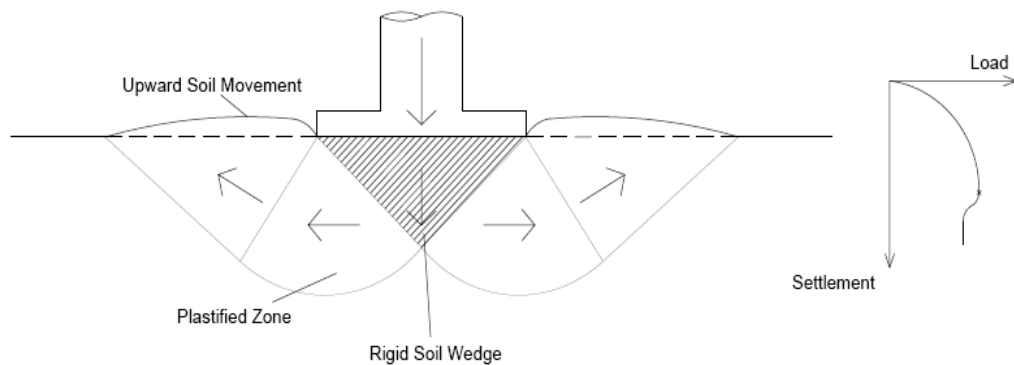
Failure surface of a shallow strip foundation at limit equilibrium.
